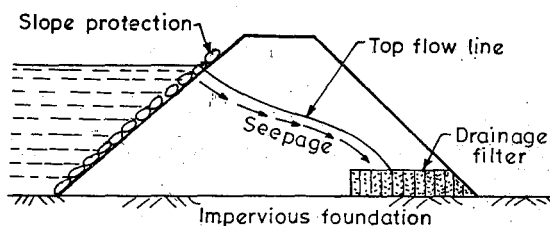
(b). Homogeneous embankment provided with a drainage filter.
